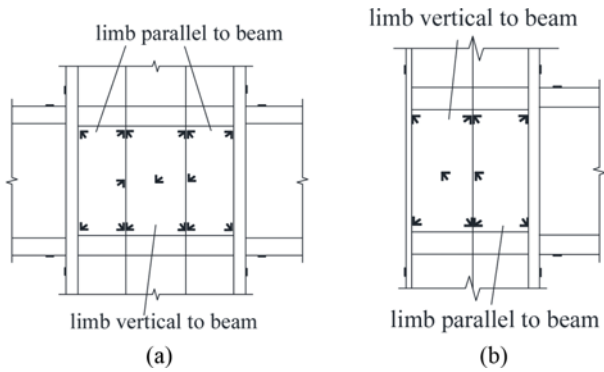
Layout of Strain Gauges for Specimens: (a) S+ Specimens, (b) ST and SL Specimens
